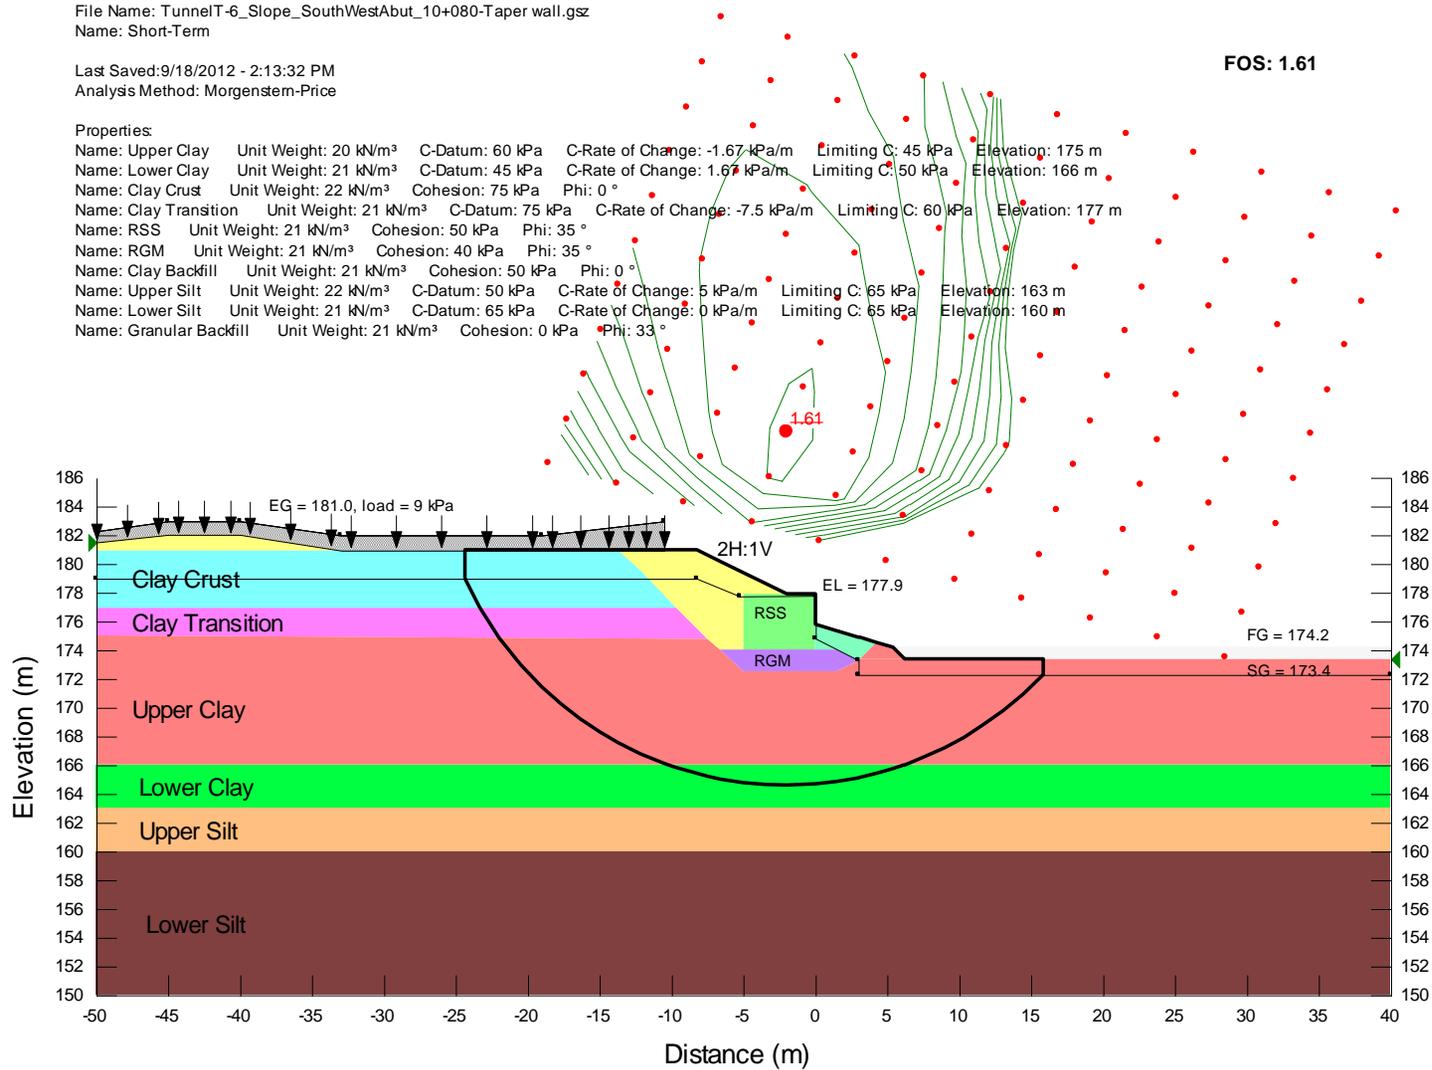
Global Stability Result - Tapered Wing Wall South (10+080) - End of Construction (Undrained) Loading
